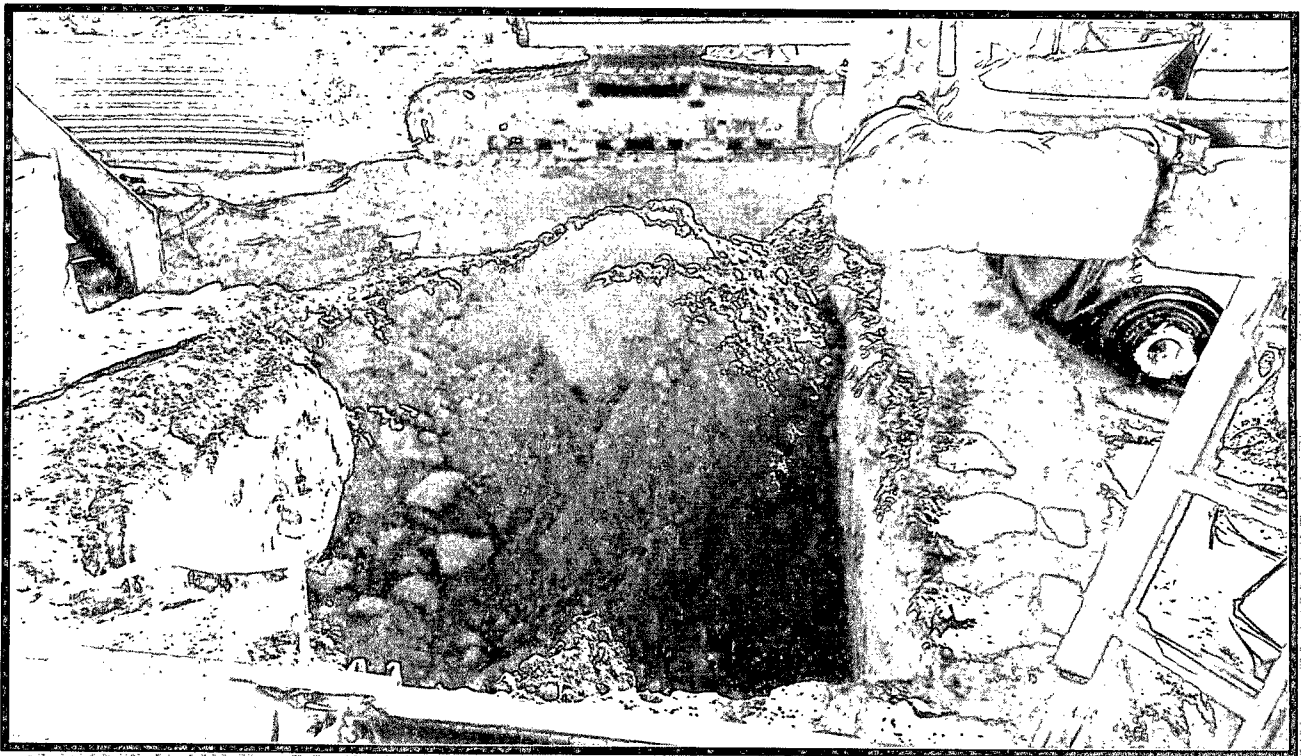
First stage of excavation in central portion of battery containment beneath eastern AST.
